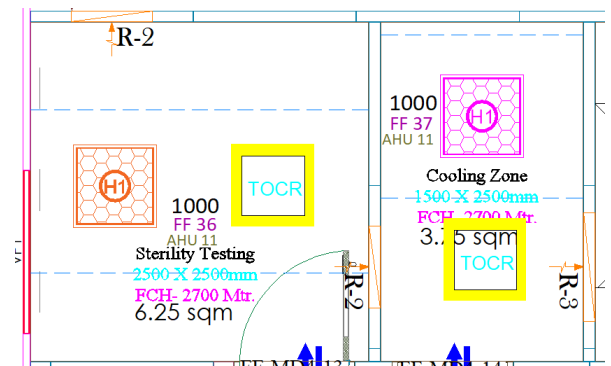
Lighting Layout for Sterility Testing and Cooling Zone with Top Opening Cleanroom Luminaire
